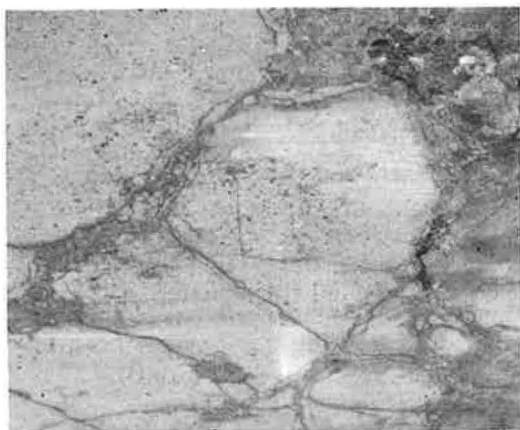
Close-up of cracking and spalling of concrete subjected to sulfate reaction.
